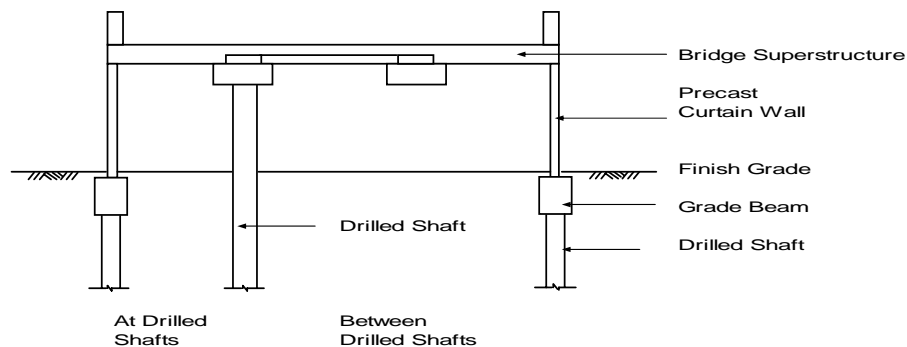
Elevated Slab-on-Piles (SOP) Design Concept
